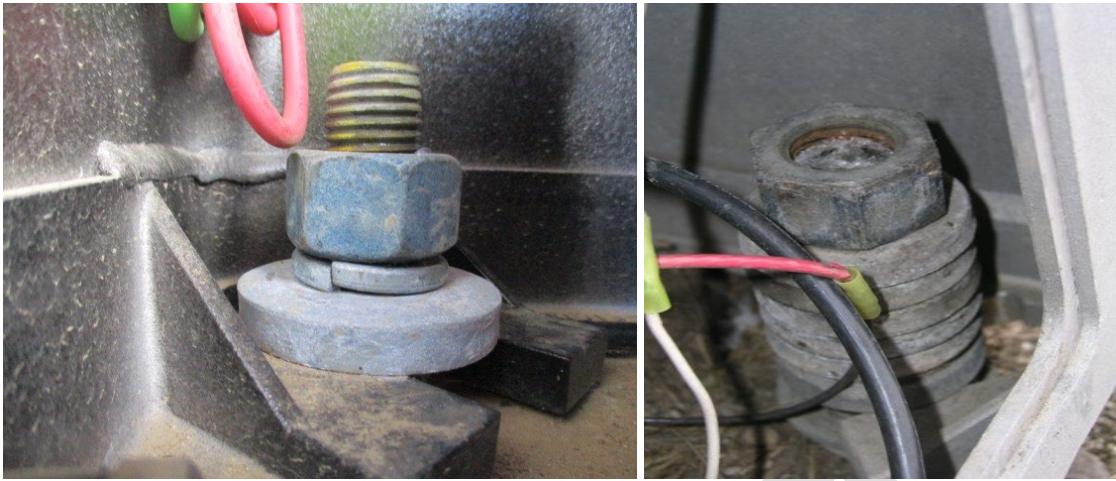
Frangible pole structure anchor bolts and leveling nuts foundation, loose anchor bolt (left), anchor nut without fully engaged thread (right)
